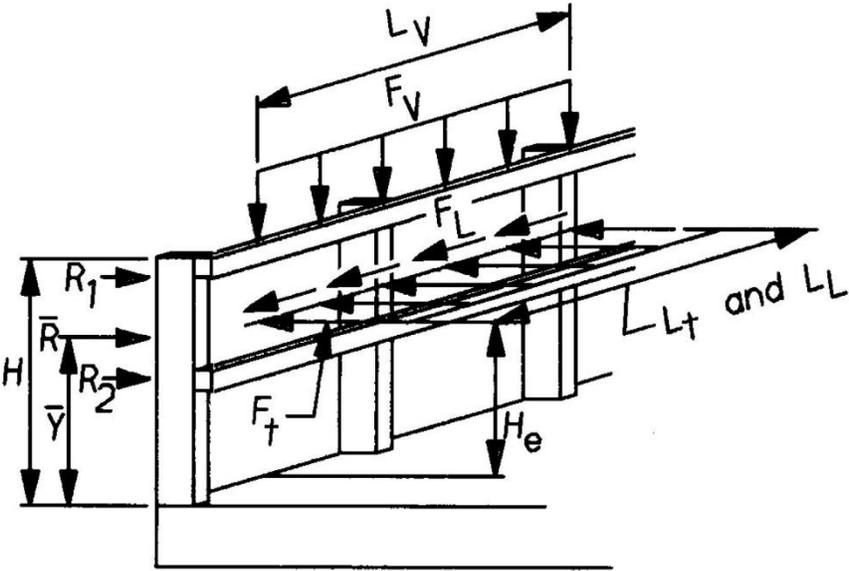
Metal Bridge Railing Design Forces and Designations [15]
